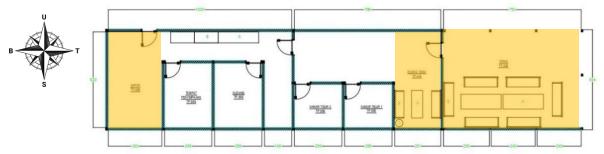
Floor plan of the house belonging to Mr. Lasiyo Source: Widyaswati, 2023
